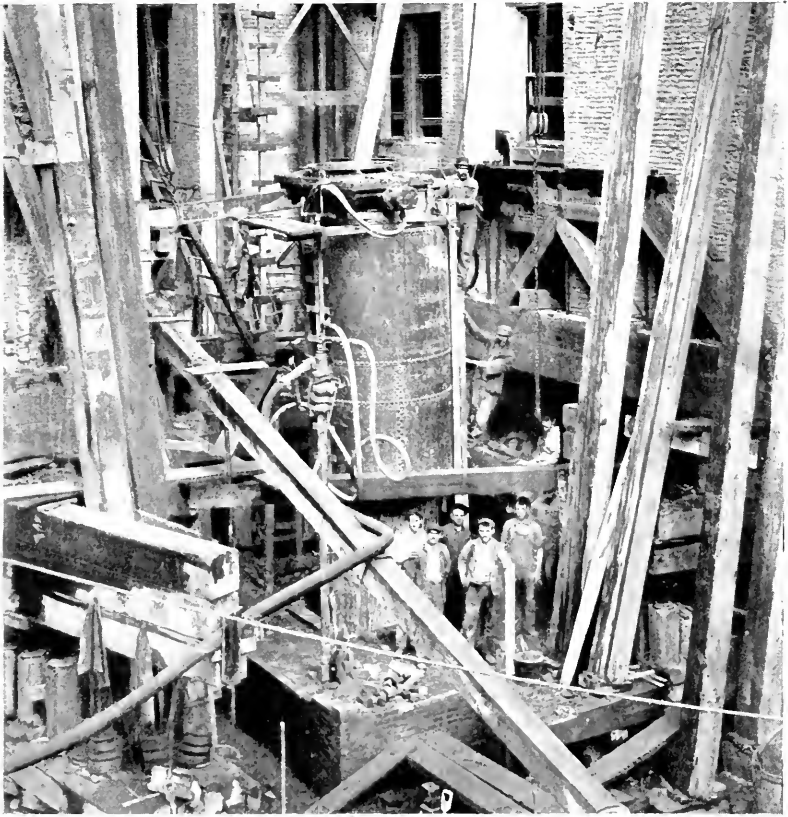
COMPRESSED AIR IN FOUNDATION WORK. SINKING A CAISSON FOR THE FOUNDATION OF THE AMERICAN SURETY BUILDING, NEW YORK CITY.
